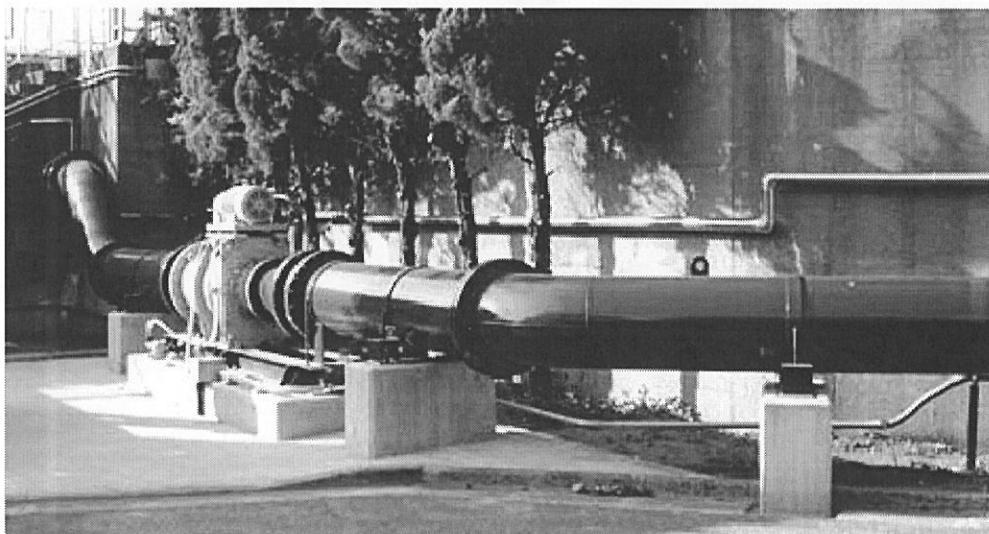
Picture of a typical site installation (Sewage water treatment plant).
